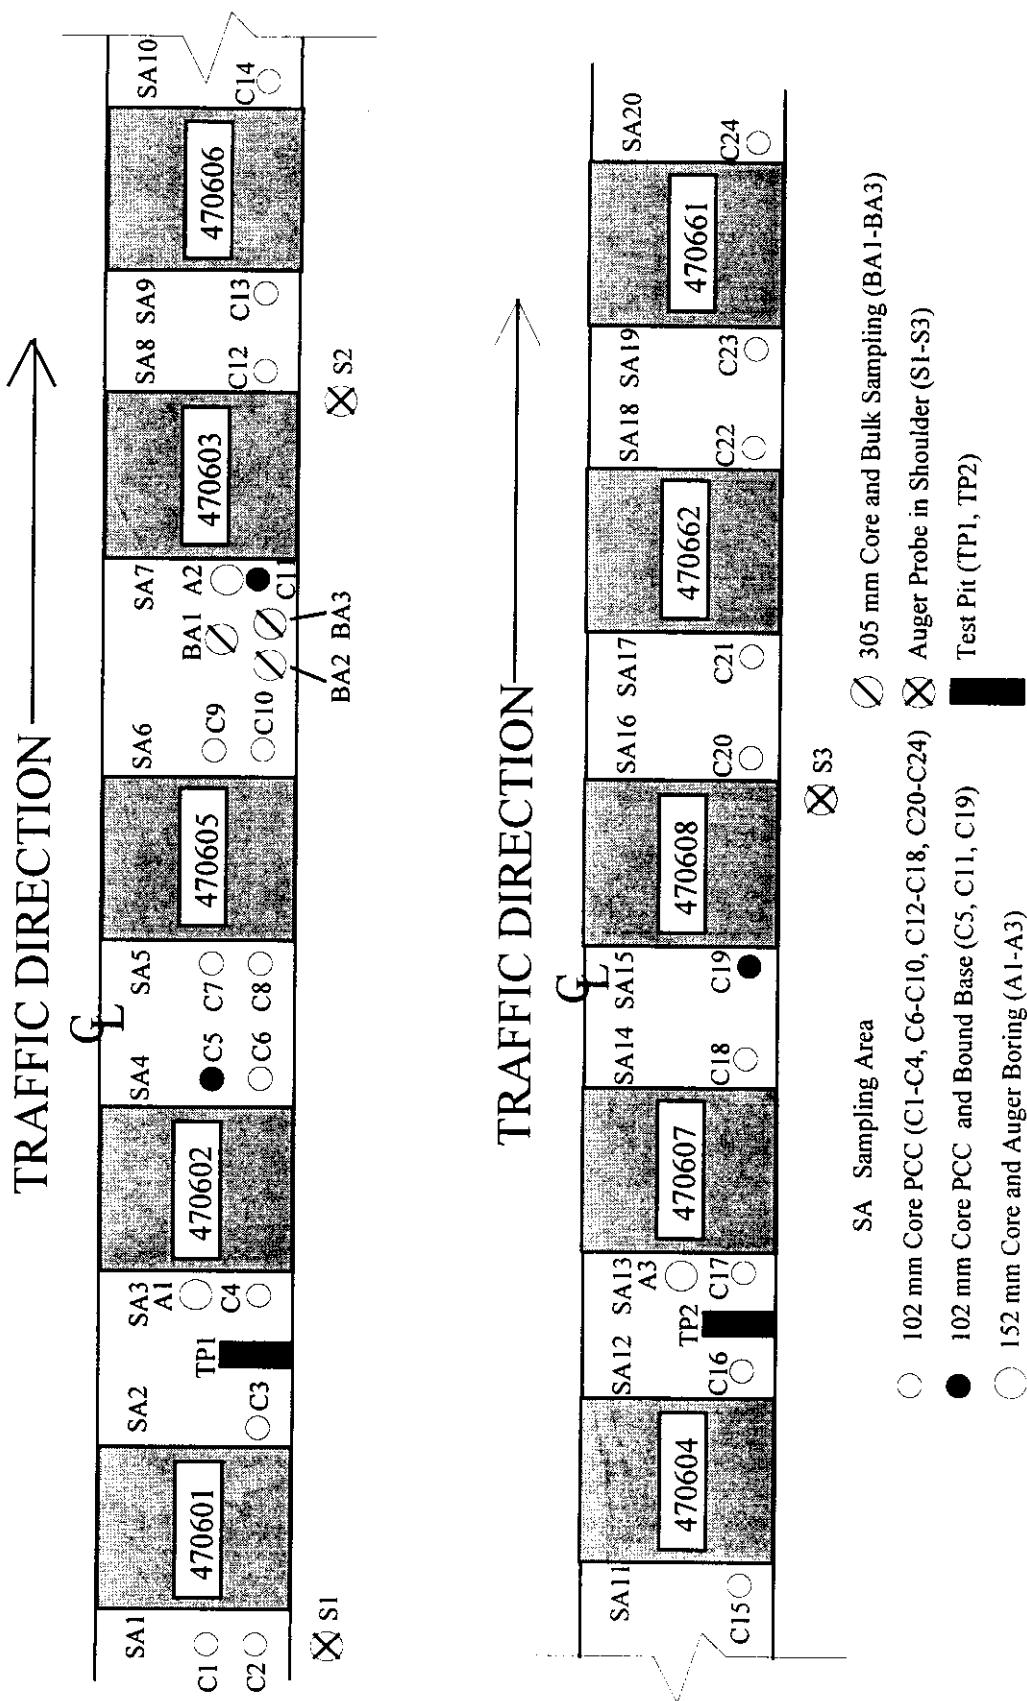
SITE LAYOUT WITH SAMPLING AREA LOCATIONS
